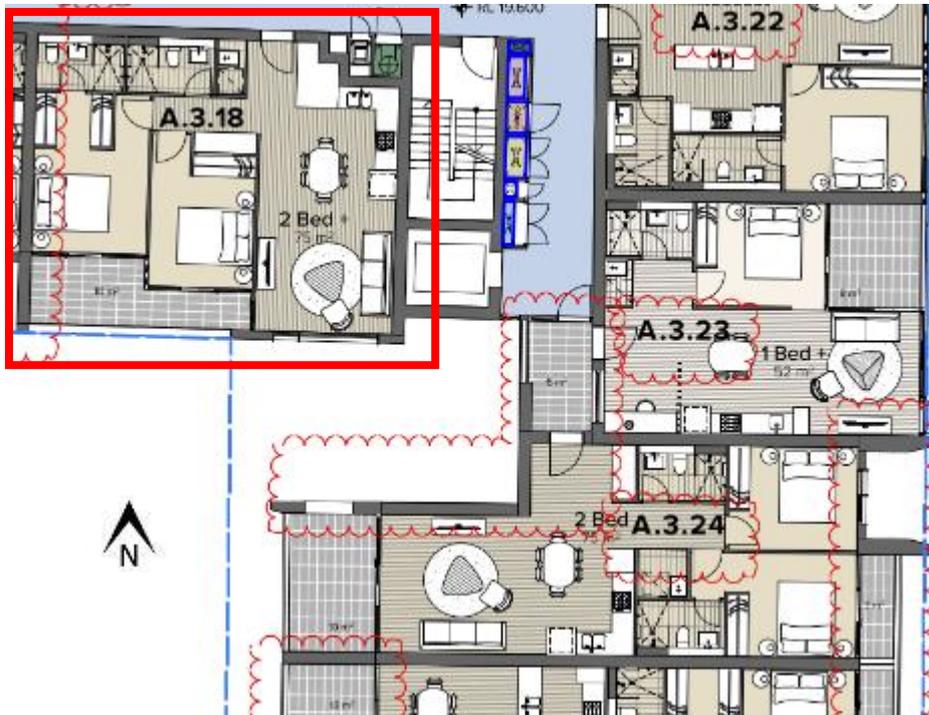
Extract from the level 3 plan, illustrating the apartment layout to be replicated on the levels below
